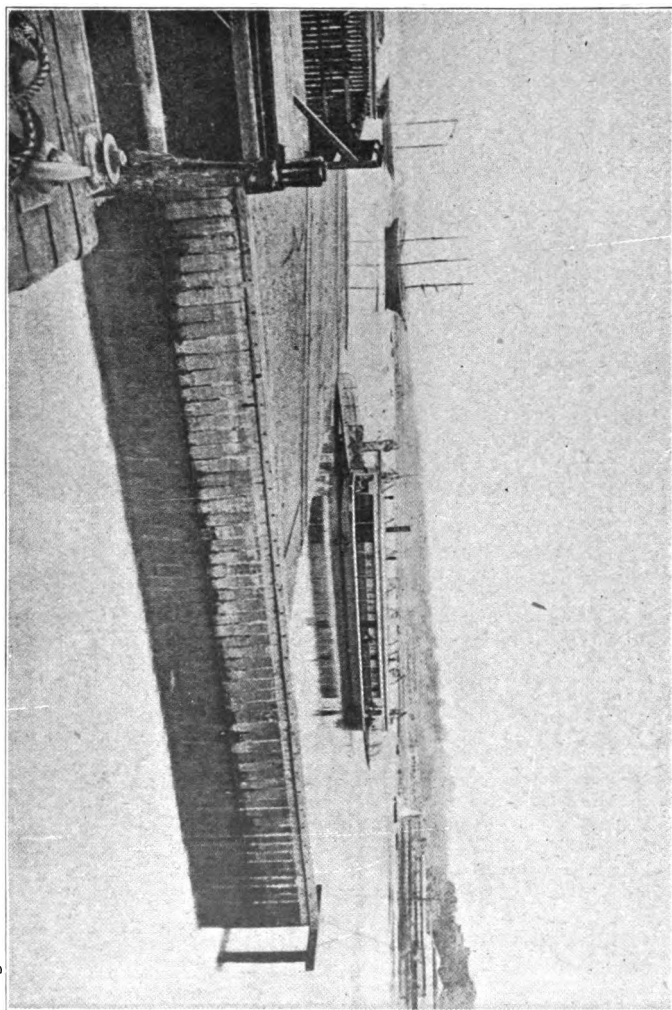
Retaining Bank, Southampton, England, The piles are driven into 17 feet of hard sand and shingles.
